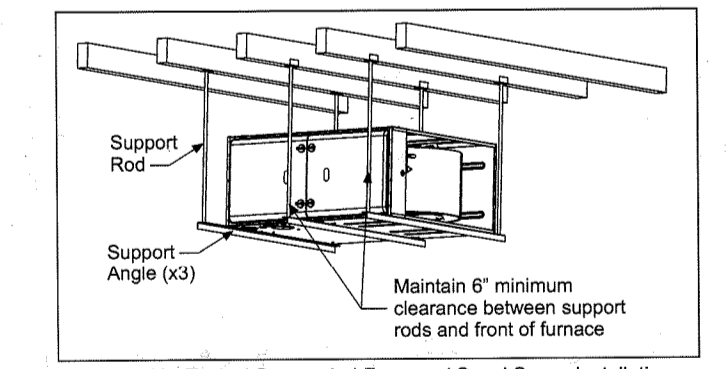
Typical Suspended Furnace / Crawl Space Installation
